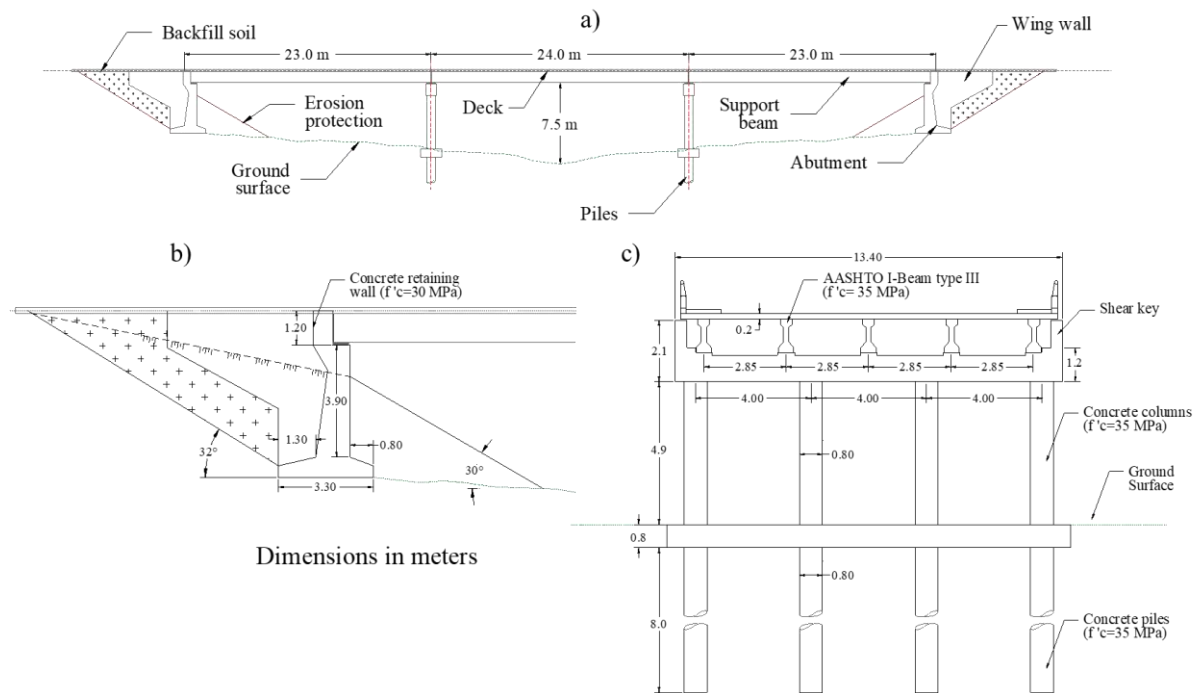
a) Longitudinal view of the bridge under study b) Abutment configuration c) Cross-section of the middle support and foundation.
